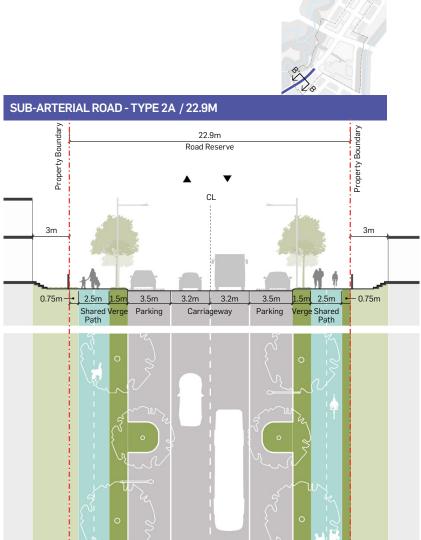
Indicative Street Section B-B' - Sub-Arterial Road - Type 2A
